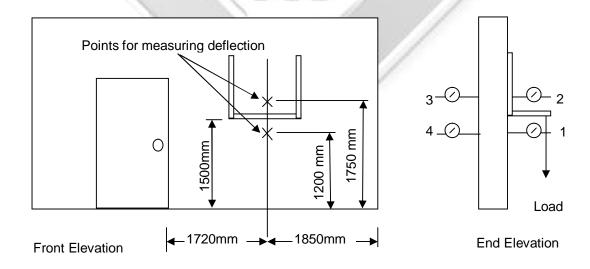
Locations of applied load for heavyweight anchorage (High level wall cupboard) eccentric downward loading test
